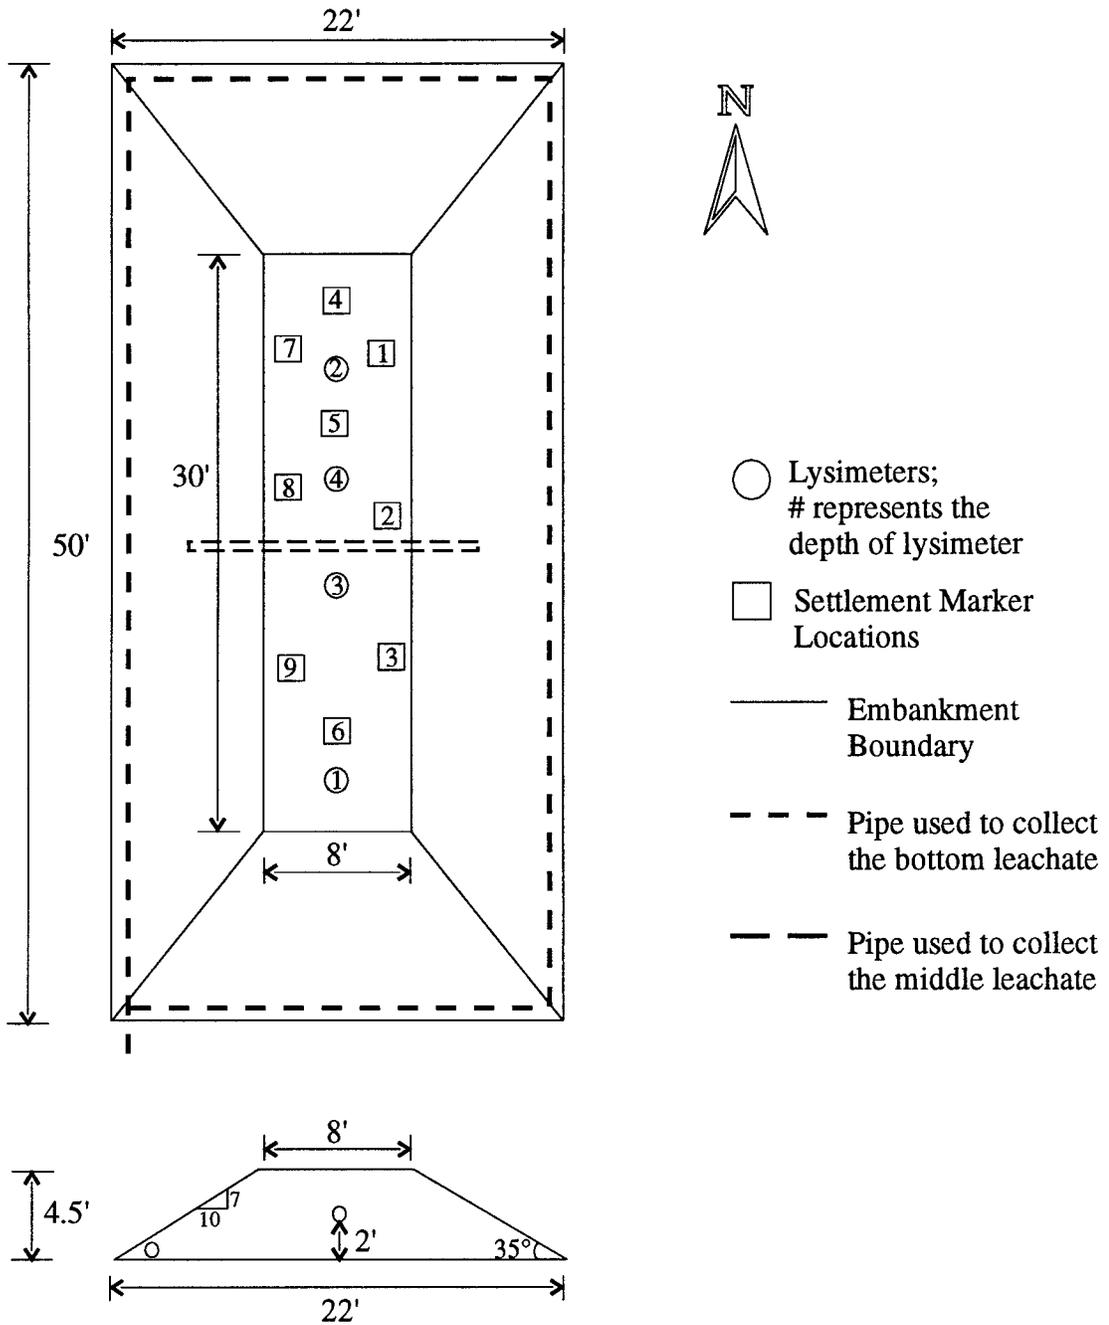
The plan view (top) and cross-section (bottom) of the test embankment.
